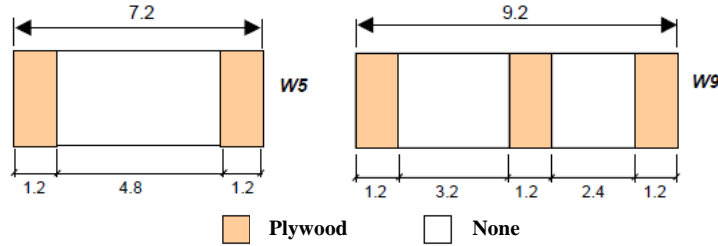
Plywood Sheathing on Exterior of Walls 5 and 9 (Paevere et al. 2003)
